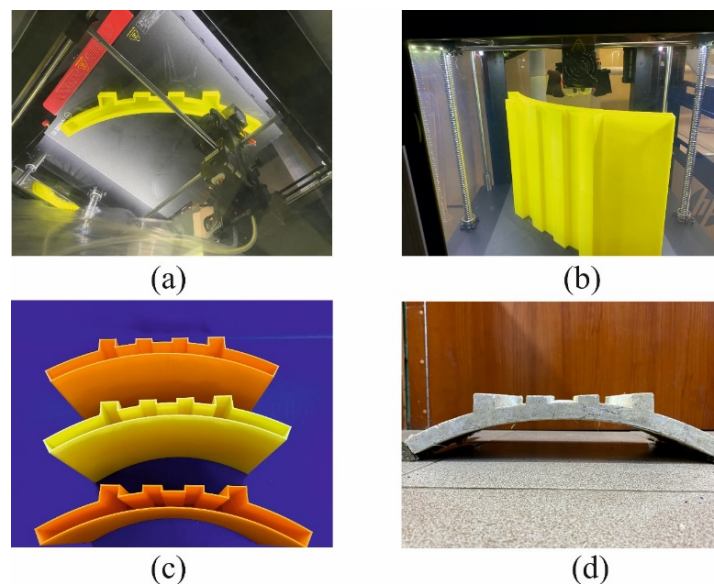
3D printed mold for concrete casting: (a) and (b) printing the mold; (c) printed molds; (d) cast arch Type I.
